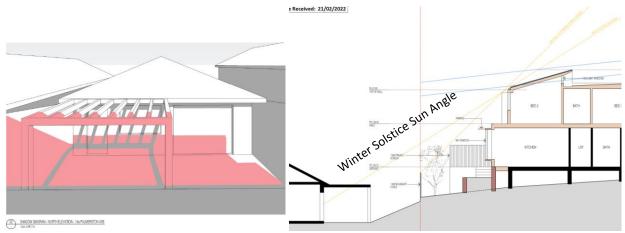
Proposed shadows to the northern elevation of 14A Palmerston Avenue and the first floor in relation to the winter solstice sun angle.
